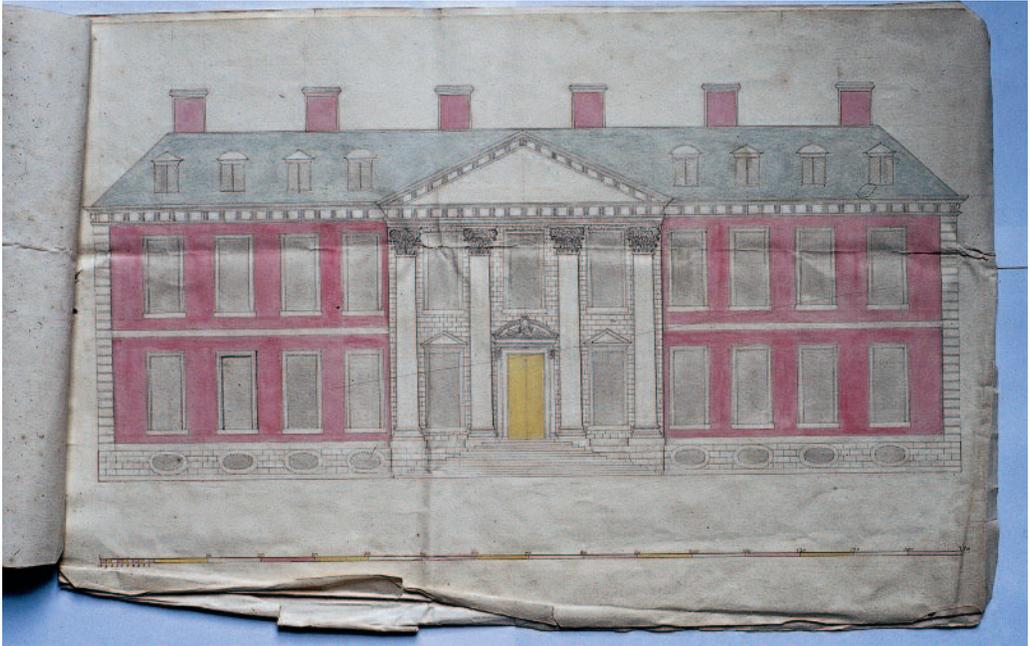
Kiveton Park, west elevation, contract drawing by Daniel Brand, 1698.
